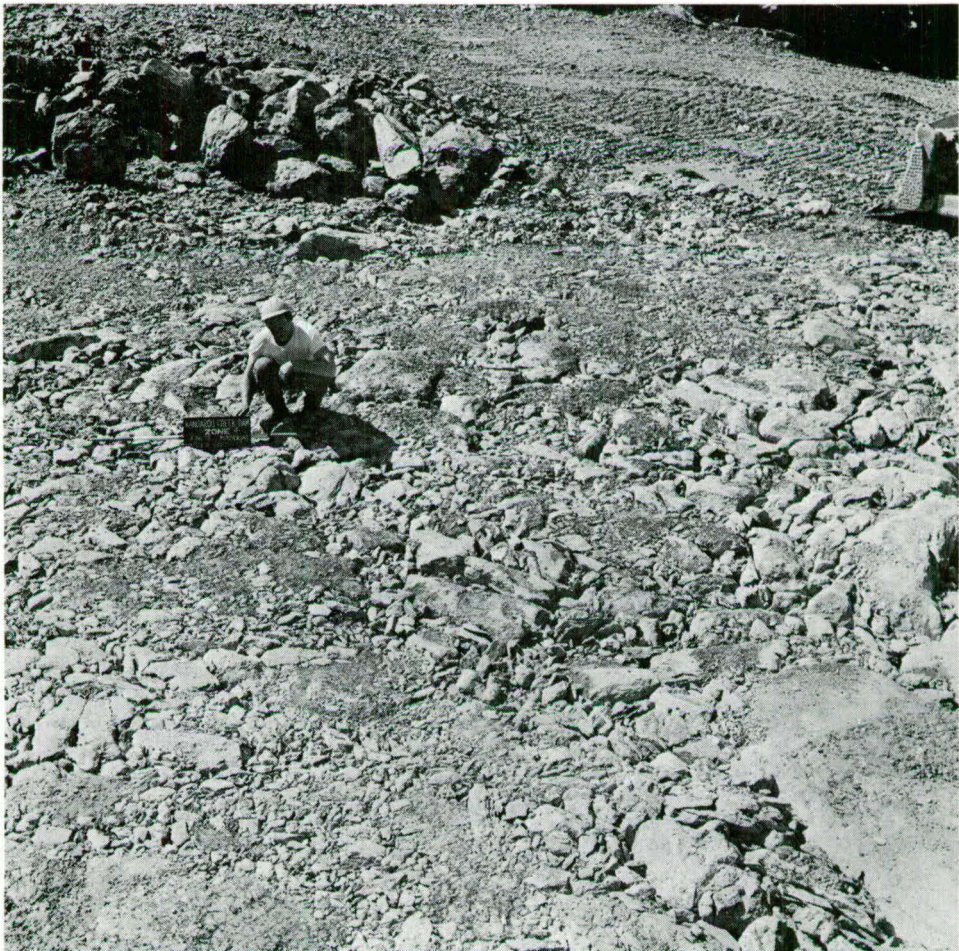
Surface of typical zone 4 layer; material is gneiss from knob excavation.
